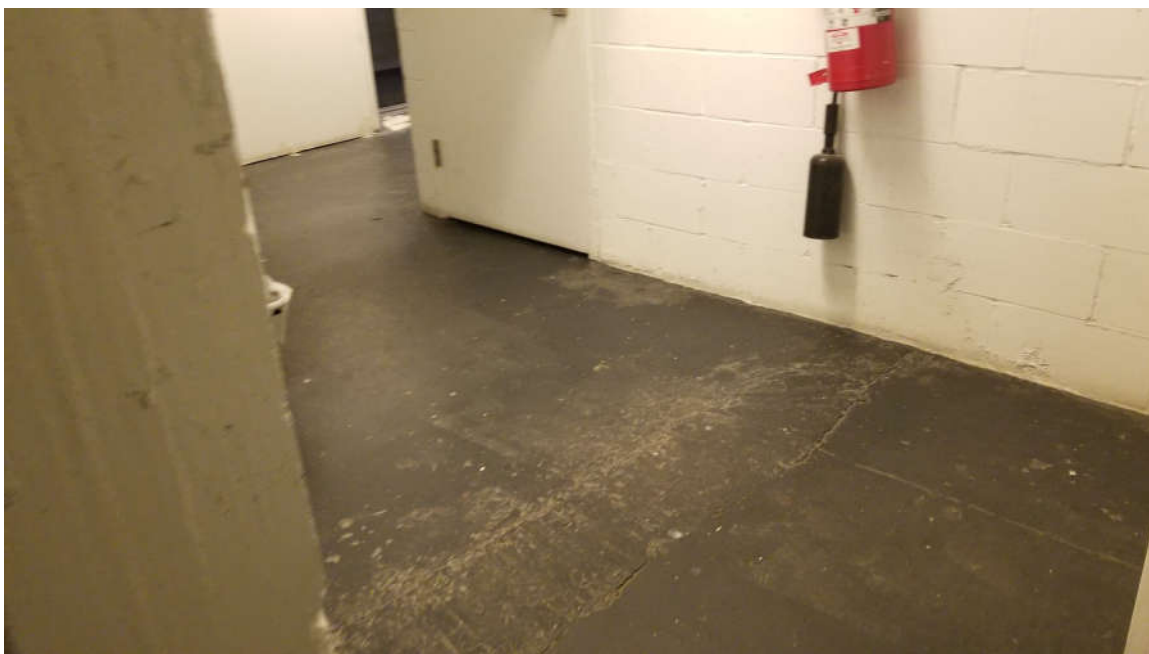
View of concrete floor in cellar Compactor/Recycling Room.
